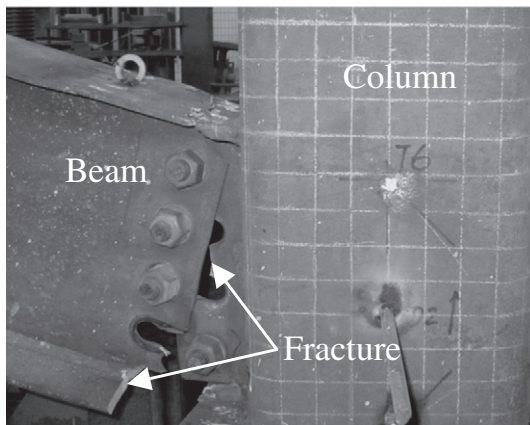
Failure modes of the RHS column to H-beam joint [15].
